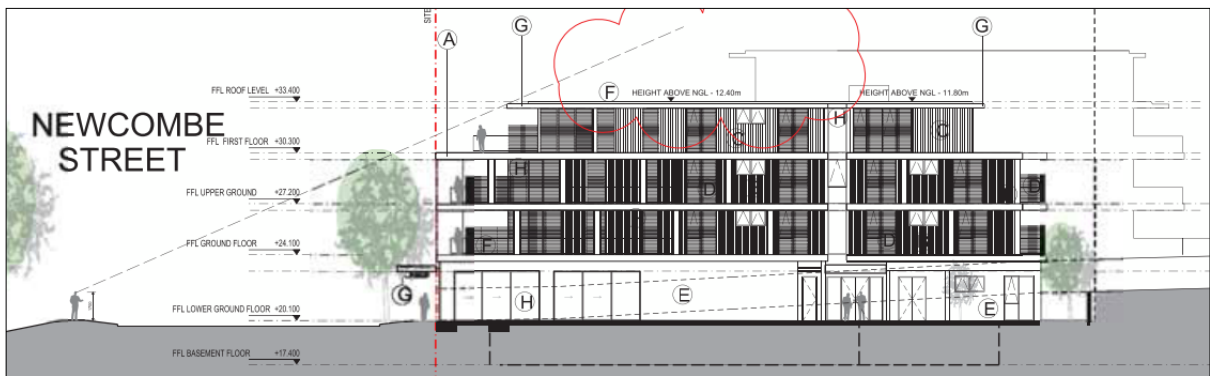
West Side Elevation Showing Upper Levels Recessing from Newcombe Street
